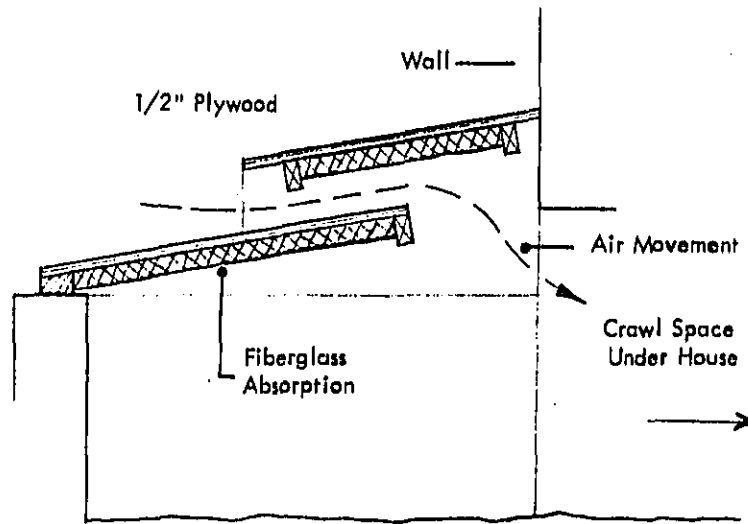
BAFFLE BOX FOR SIDEWALL VENT
